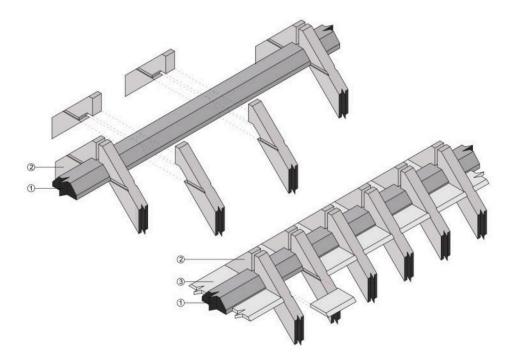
Church of Ayia Marina at Filousa village (three-aisled, 17^{th} cent.). Detail showing the construction of the highest part of the Inner Roof, where internal rafters are connected to the ridge-purlin while holding it. Planks are then placed horizontally between the rafters in order to close firmly the gaps of the interior cover [5].
